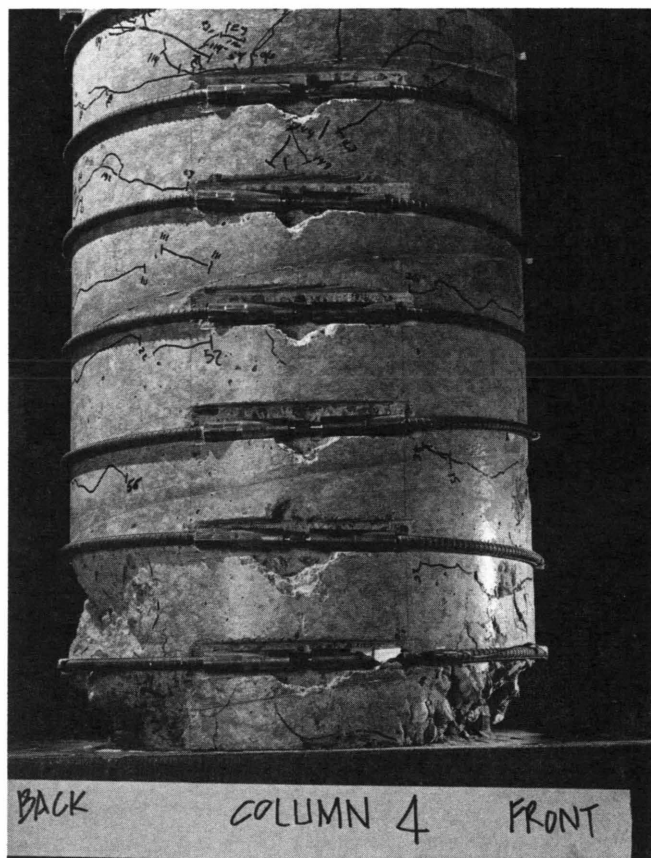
Column 4 elevation at completion of test: this column had minimum external confinement; concrete crushing developed above bottom hoop.
